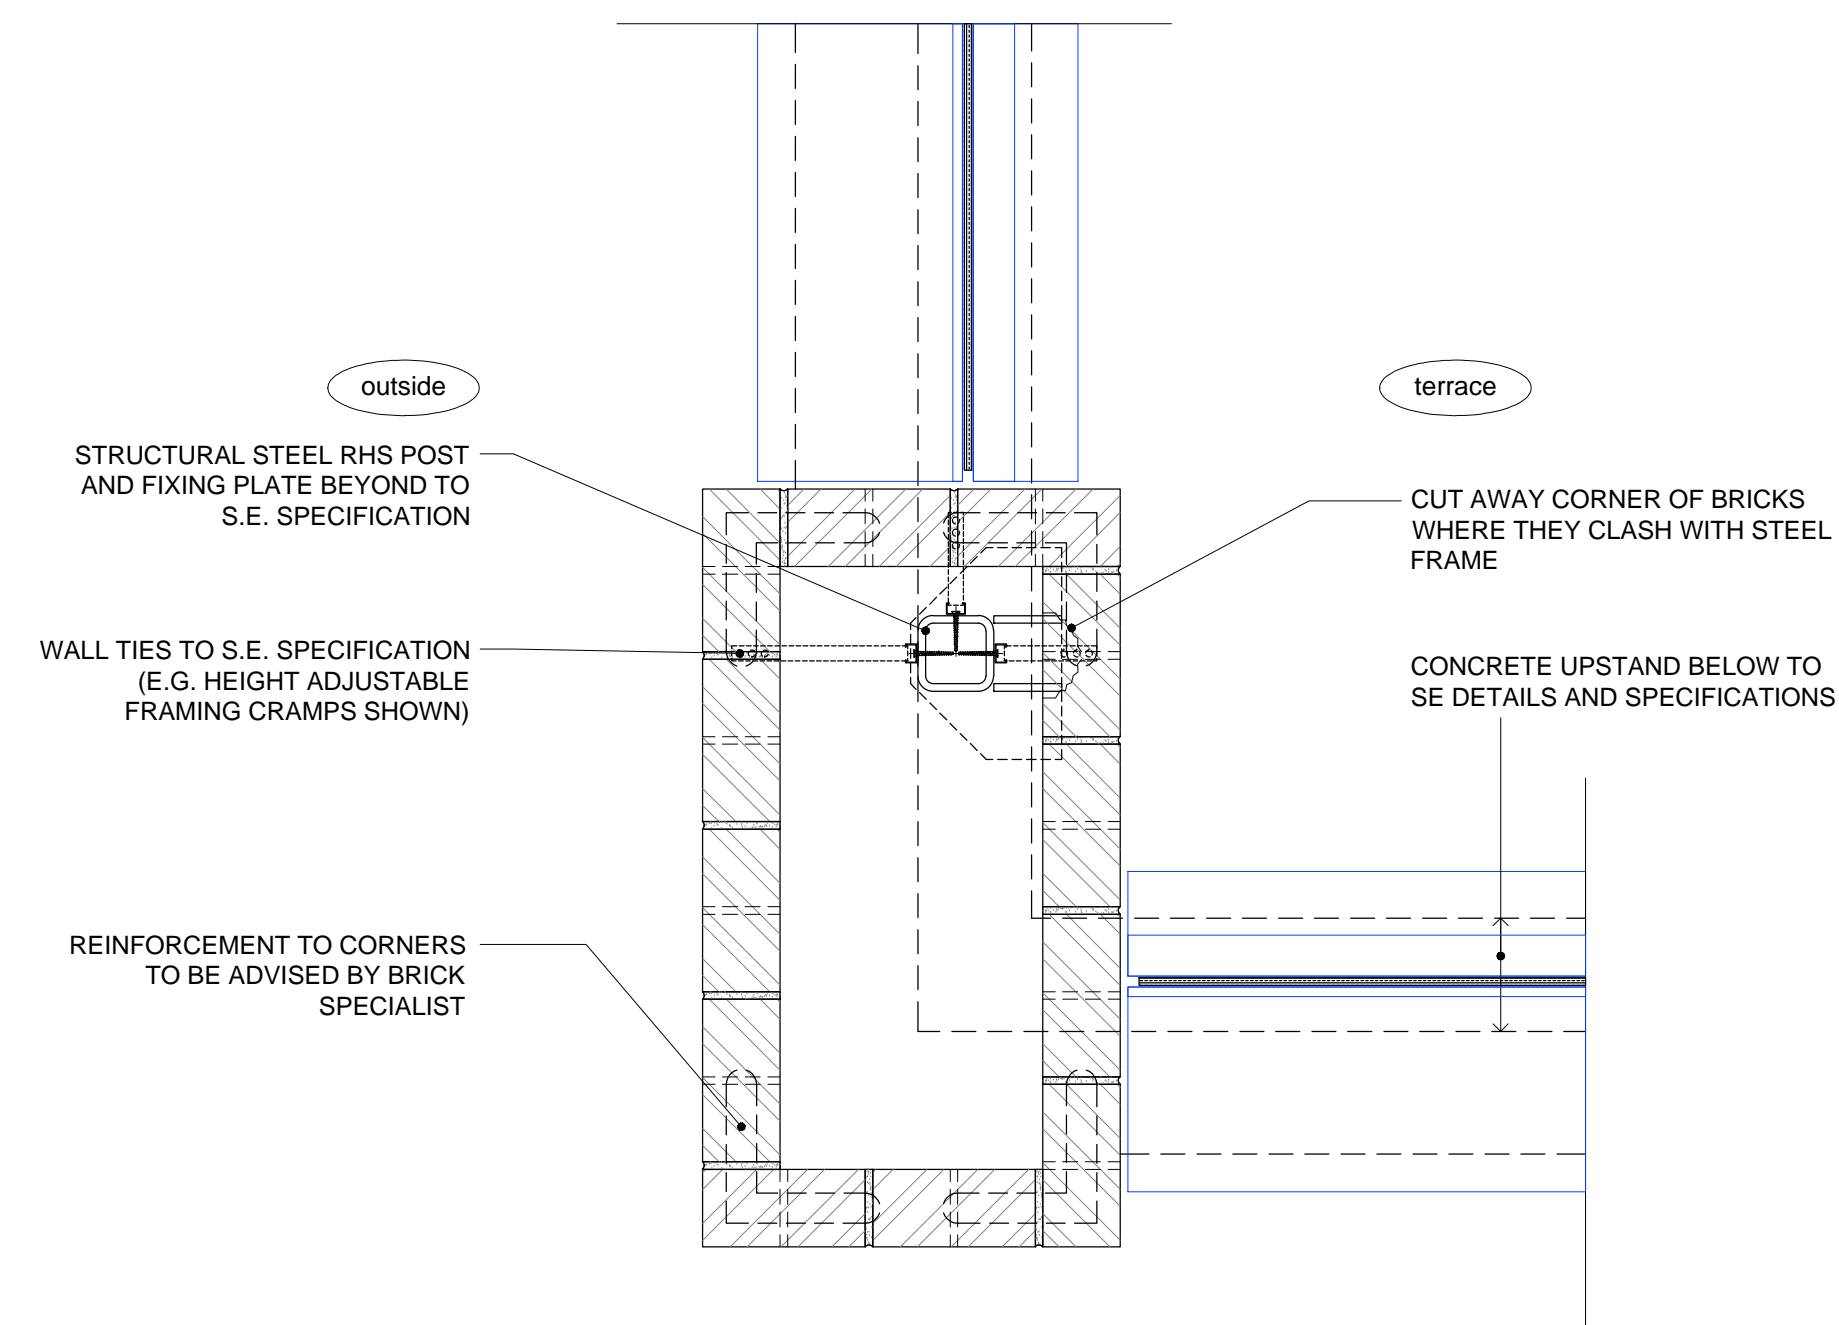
DETAIL - Block C - D-J-RC122 - Structural Post Encapsulation WT-RC1 (L01 GL E-09)
